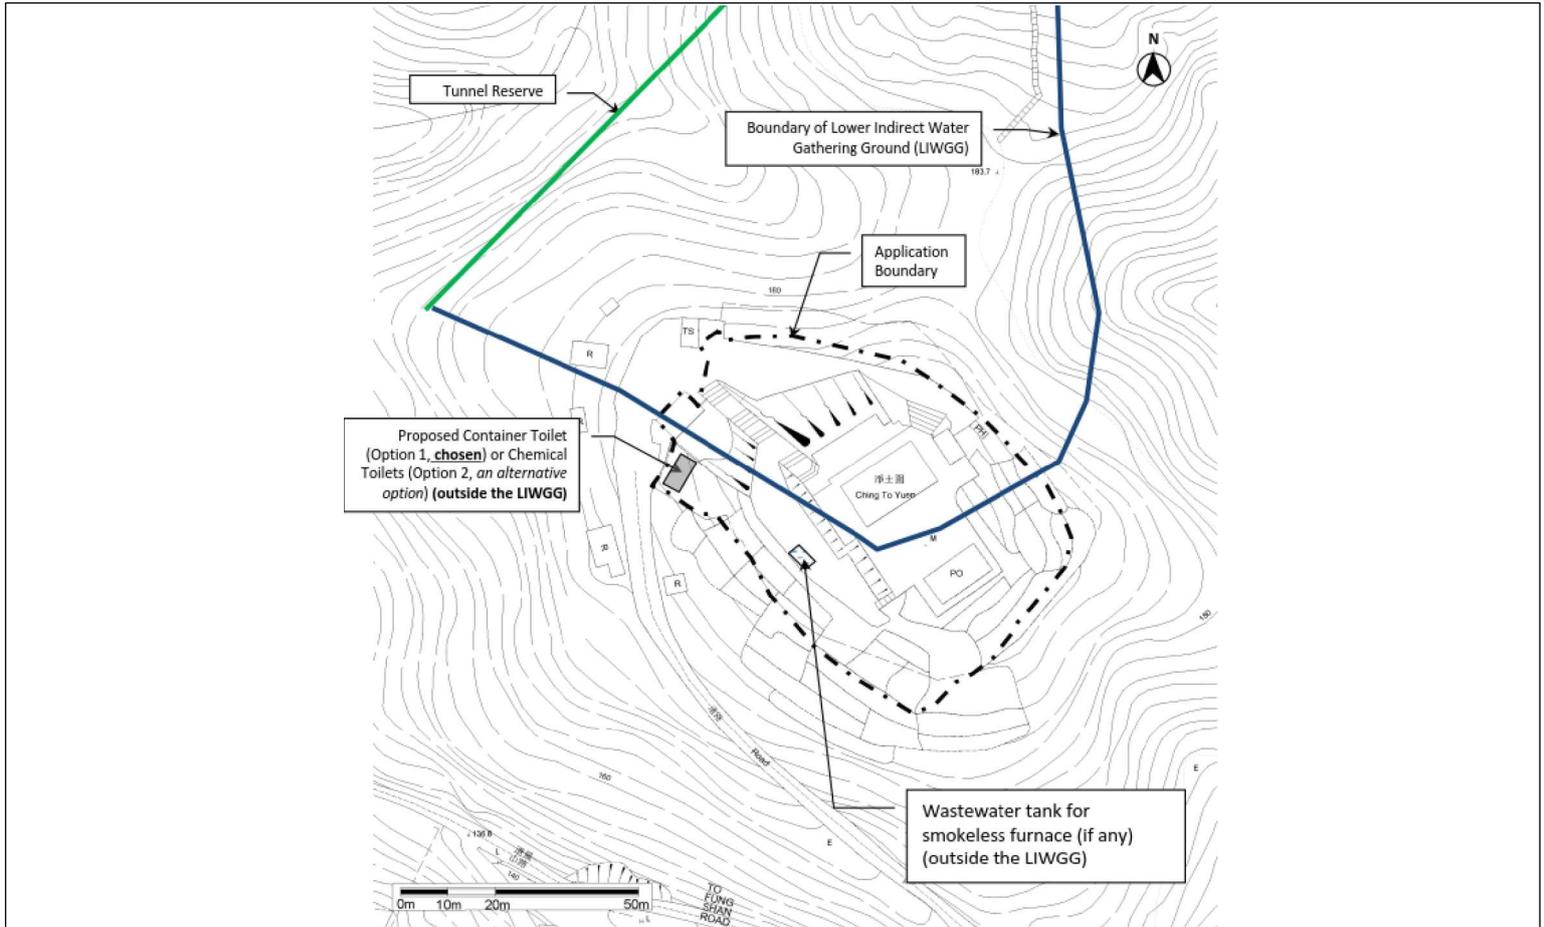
The Proposed Options for On-site Wastewater Facilities
